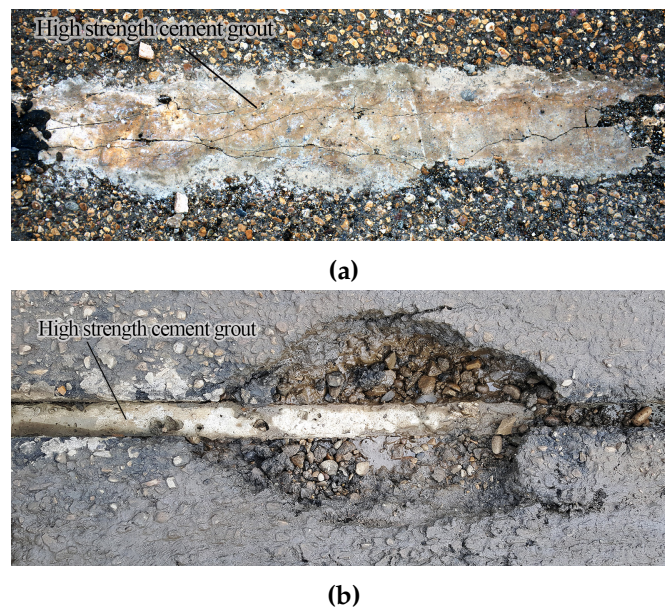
High strength grout in a micro-trench. (a) longitudinal cracks in high-strength cement grout [19], and (b) Damage to the asphalt pavement and debonding between the grout and the cut asphalt surface [19].
